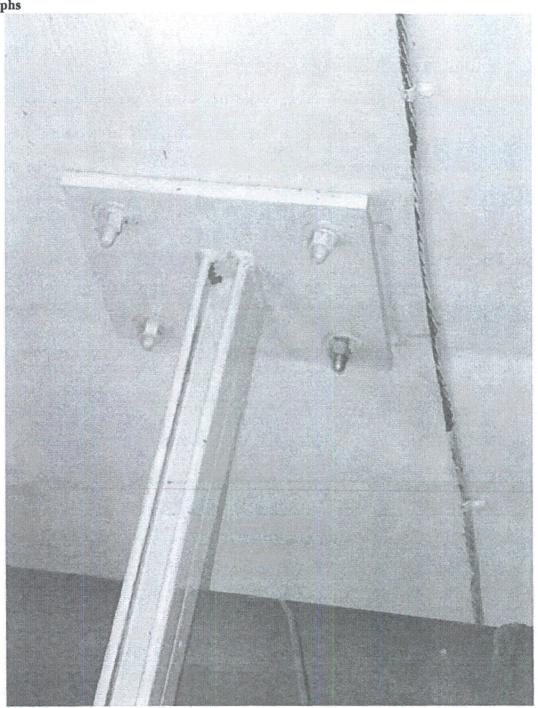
Surface Crack at Conduit Support on Wall (Unit 2 Control TD-T13)
